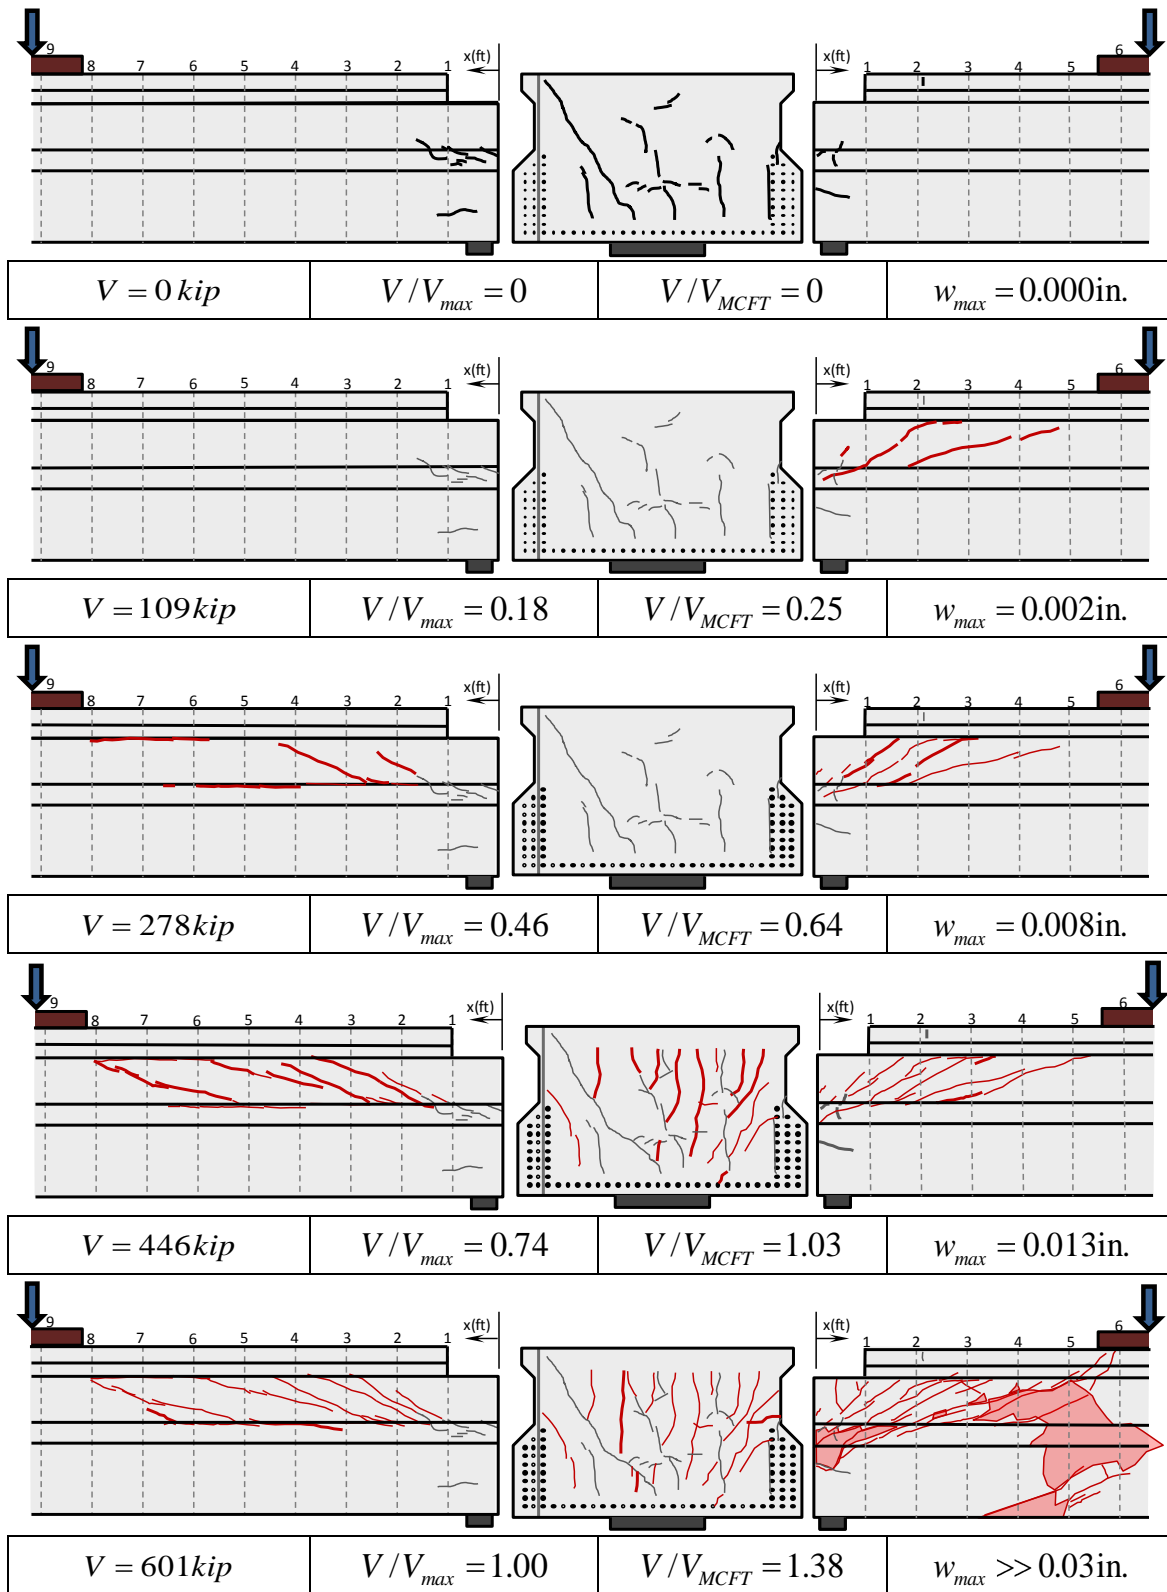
Crack Maps for 5B40-4 Skewed End Shear Test
